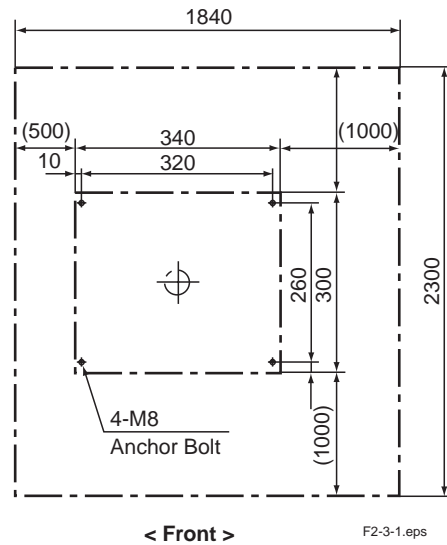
Anchor Bolt Positions and Maintenance Space Requirement (Pole-mounting Type)
